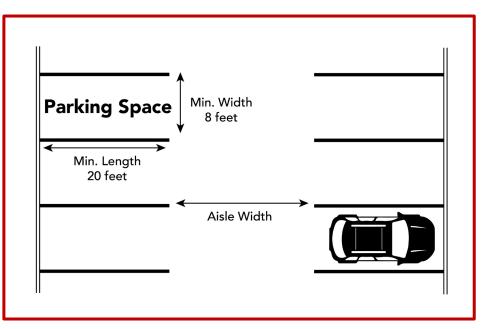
Parking Stall and Aisle Way Dimensions, 90-degree
